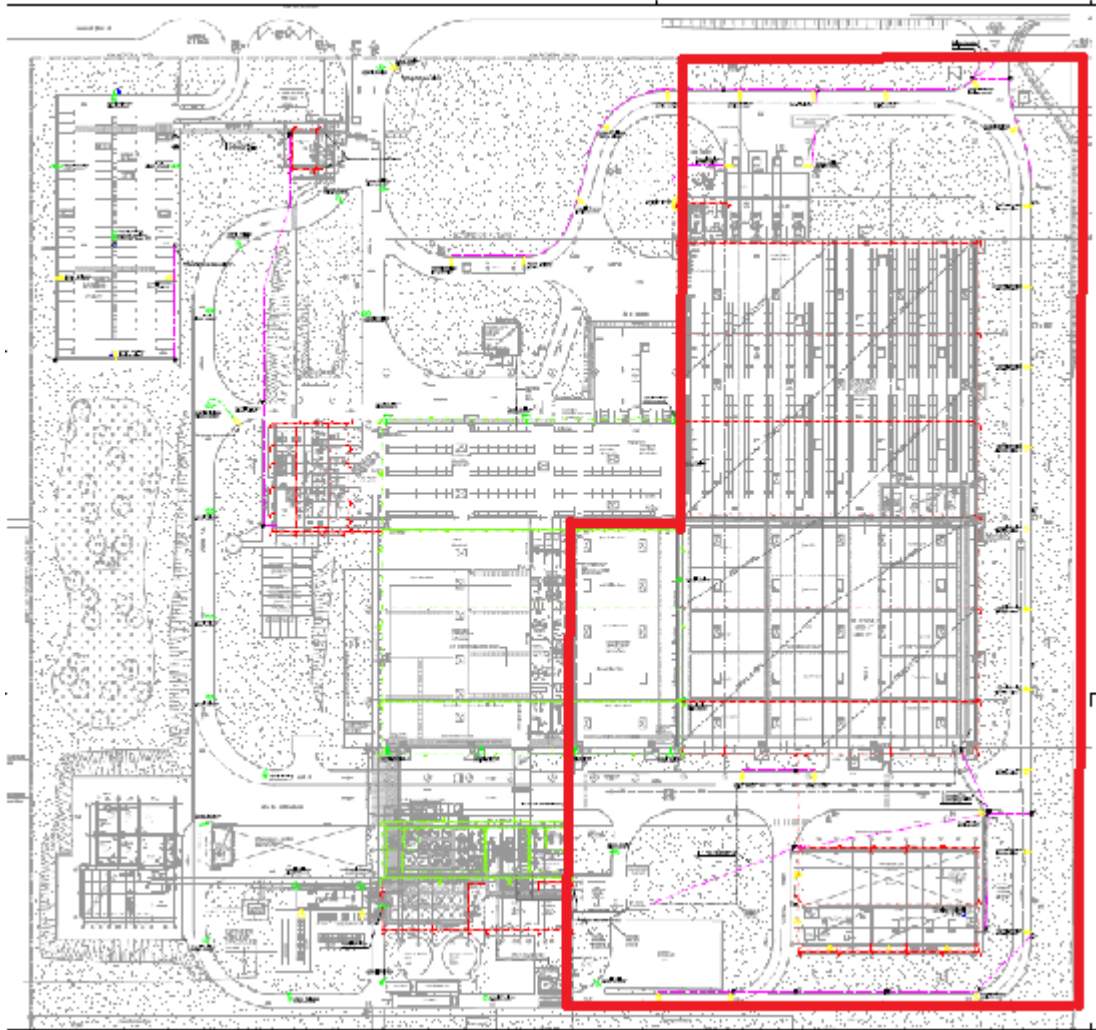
Main plan of the site with extension marked within red boundaries [19]
